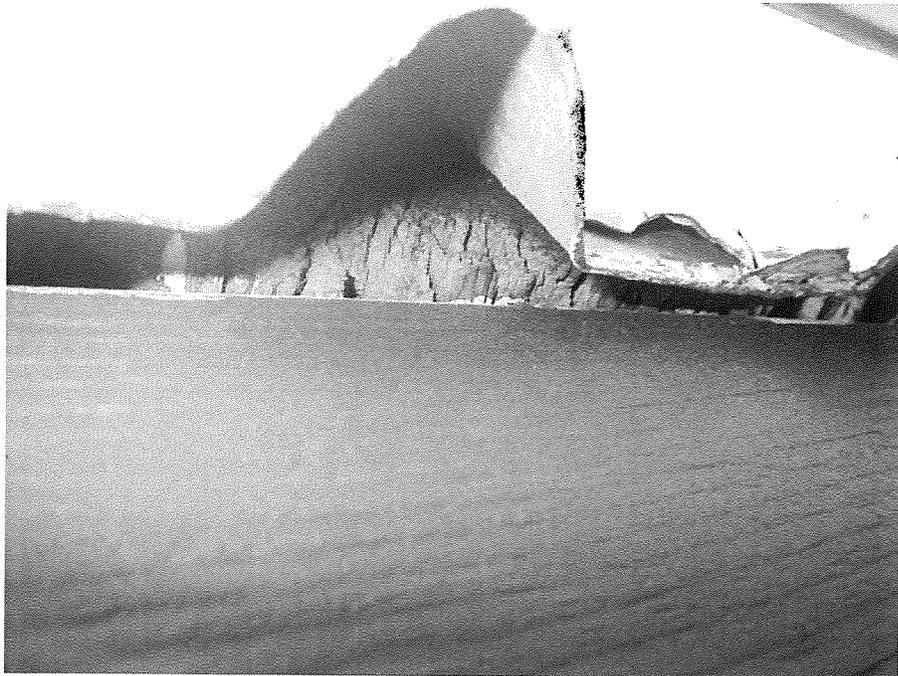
Deteriorated Plank Edges (Exterior View) (Repair per sheet S-11)
